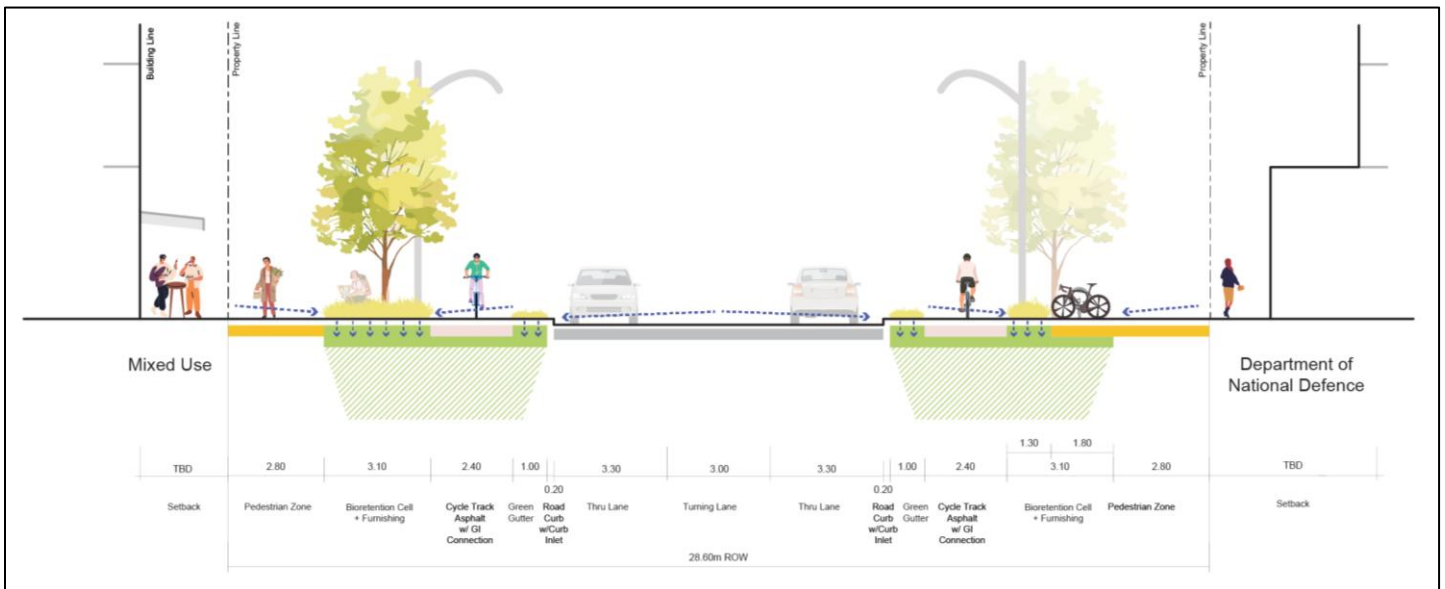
Northern Street (Billy Bishop Way to Sheppard Avenue West) Cross-Section – Option 2
